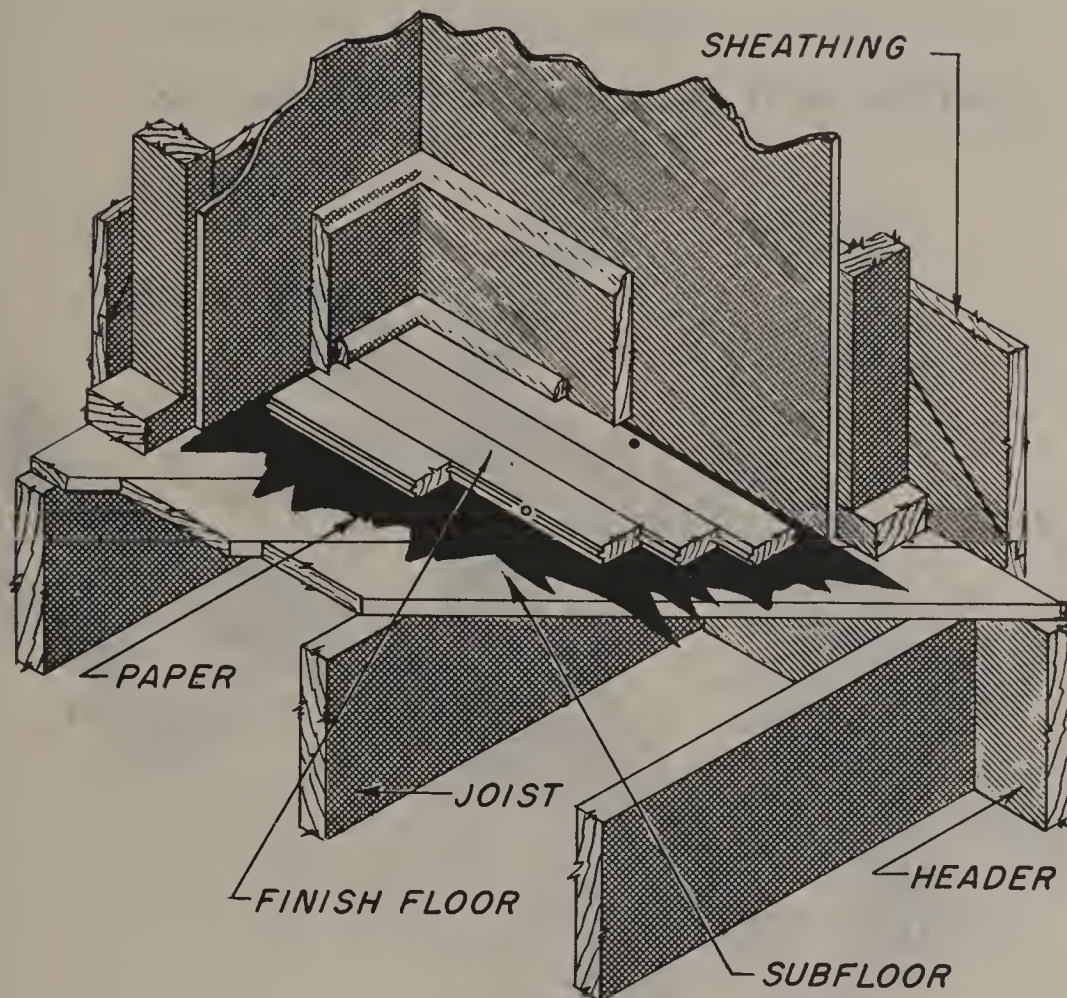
Finish flooring. Face-nail the first strip securely to joists and subfloor with tenpenny nails so placed that the nails will be hidden by the molding. Blind-nail all strips through subflooring to joist with blunt-pointed flooring nails slanted not more than 45° from the vertical and of sufficient length to penetrate into the joist at least three-quarter inch. Note: If subflooring is laid diagonally, warping or other irregularity of its surface has less effect on the trueness of the finish floor than if subfloor is transverse to joists and, hence, parallel to the finish floor. (Laying of finish floor parallel to joists is inadvisable because when so laid, subflooring of the usual thickness does not afford a sufficiently rigid nailing base to prevent squeaking of the floor.) When subflooring of any type has become warped or loosened, it should be securely renailed before placing the finish floor.
